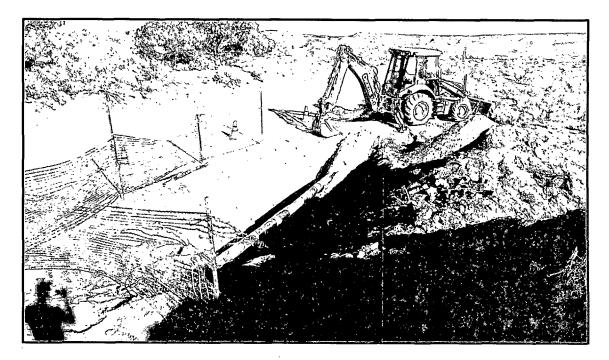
View of Lateral C-27 pipeline excavation at its fullest extent.
